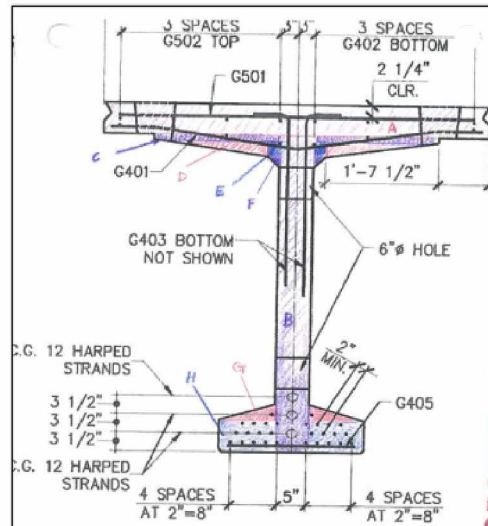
Section Properties of Tulsona Creek DBT Girder
